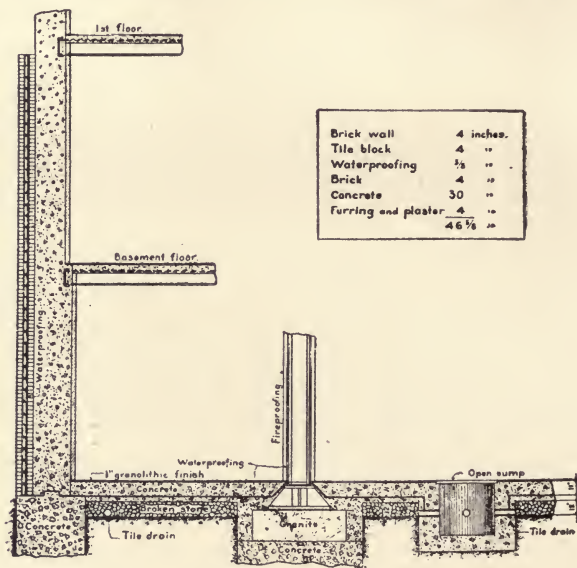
Section of Building Substructure, showing the "Membrane" Method of Waterproofing. (The Waterproofing Co.)
